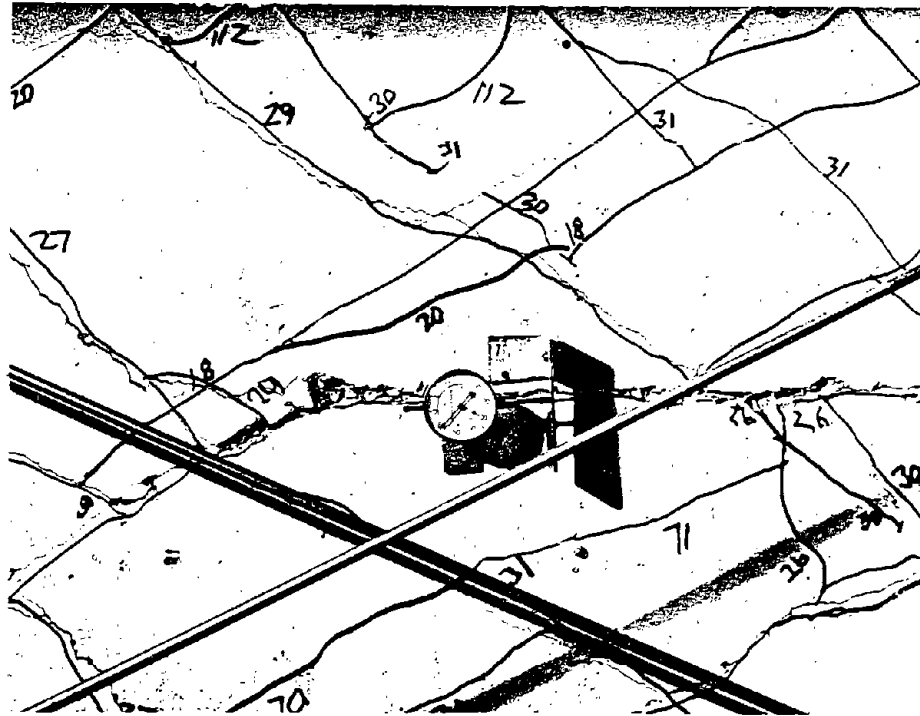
Dial Gage at Horizontal Crack
